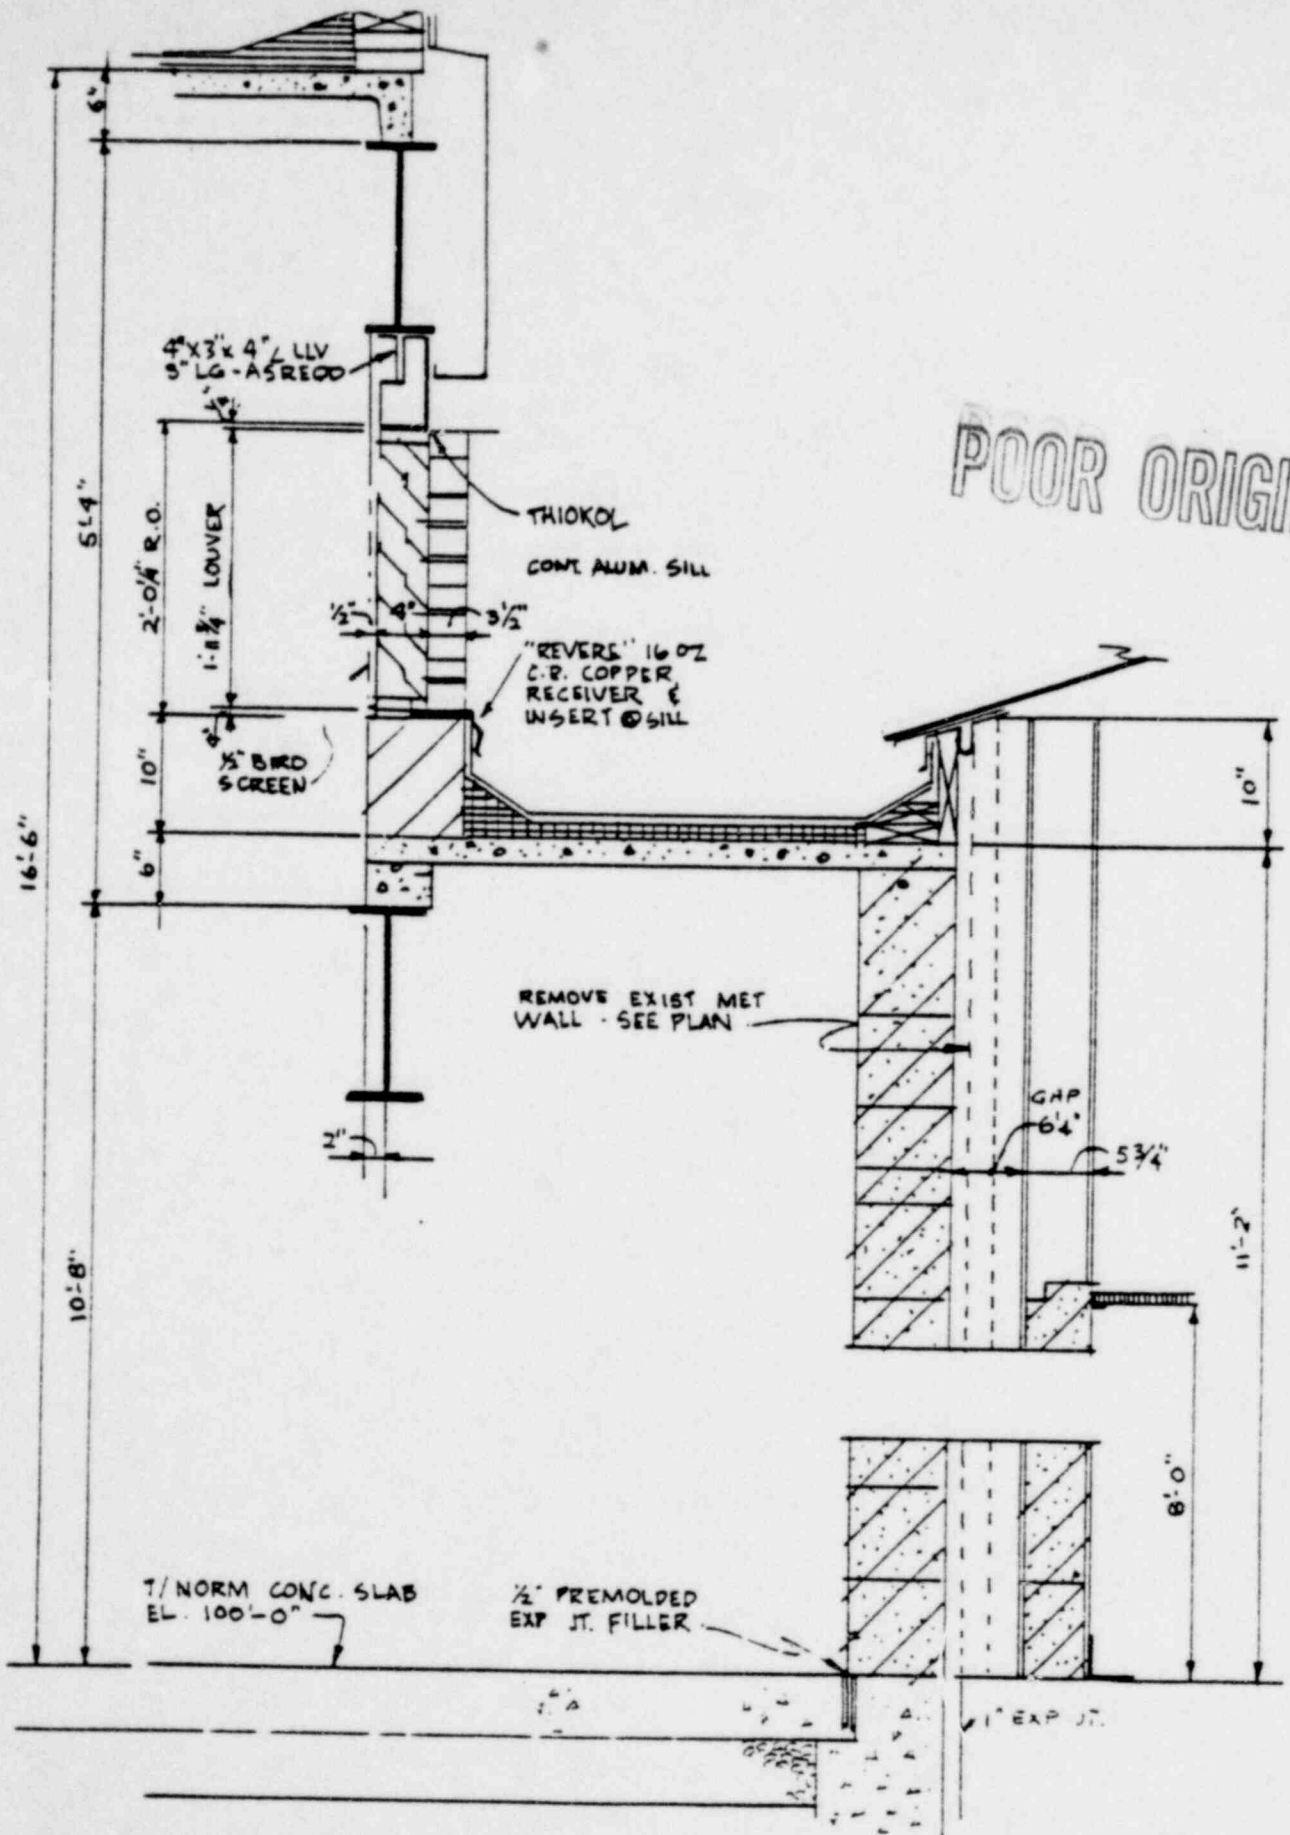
JN-4 CONCRETE CHANNEL ROOF PLACEMENT
